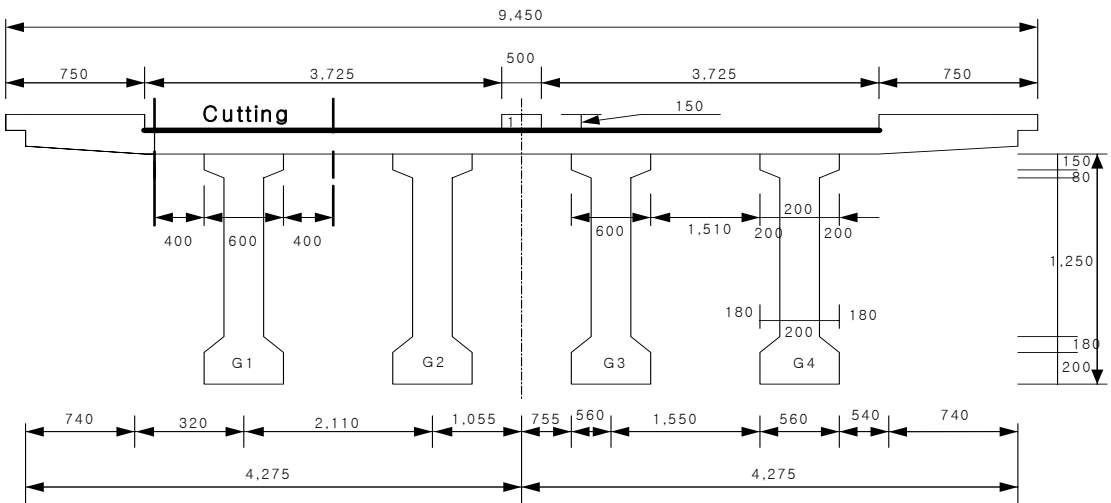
Structural outline of the PSC I-Typed girder bridge
